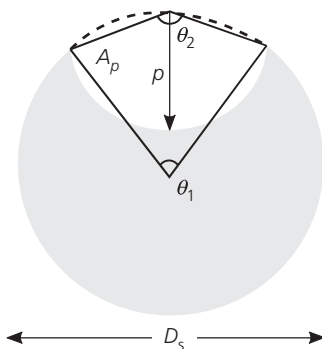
Geometry of pit in corroded rebar cross-section
